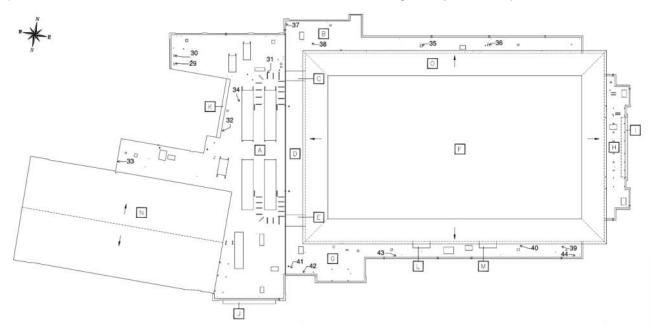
Roof Plan Identifying Roof Areas (Not to Scale) – See Appendix B for enlarged plan.
